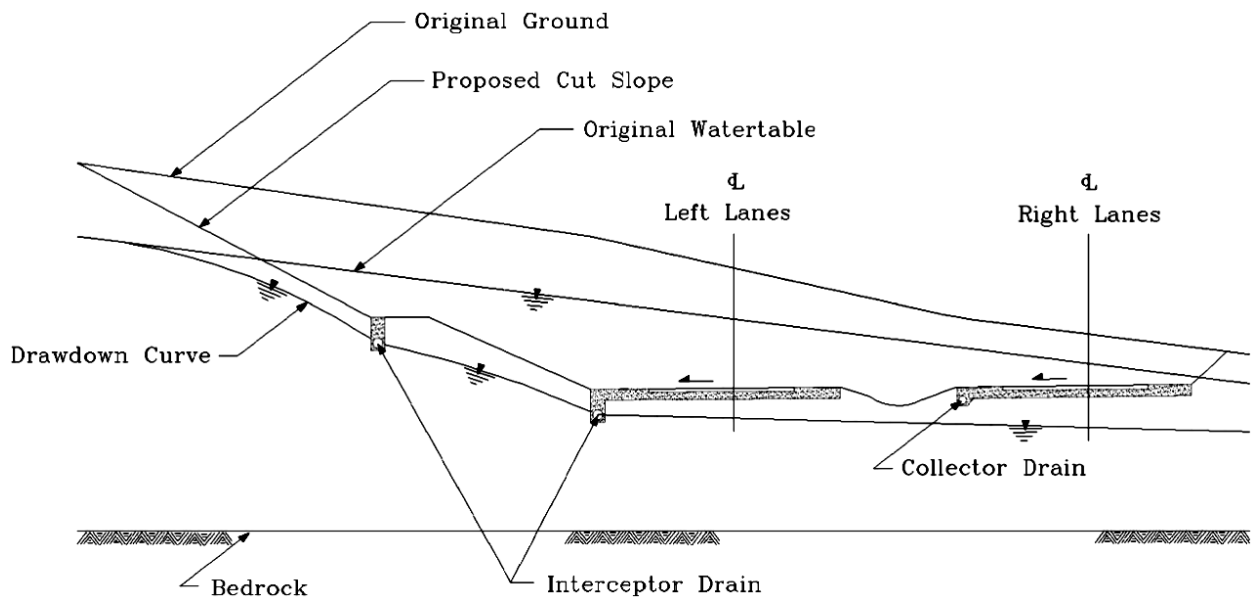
Multiple, multipurpose longitudinal drain installation (redrawn from: Moulton, 1980).
